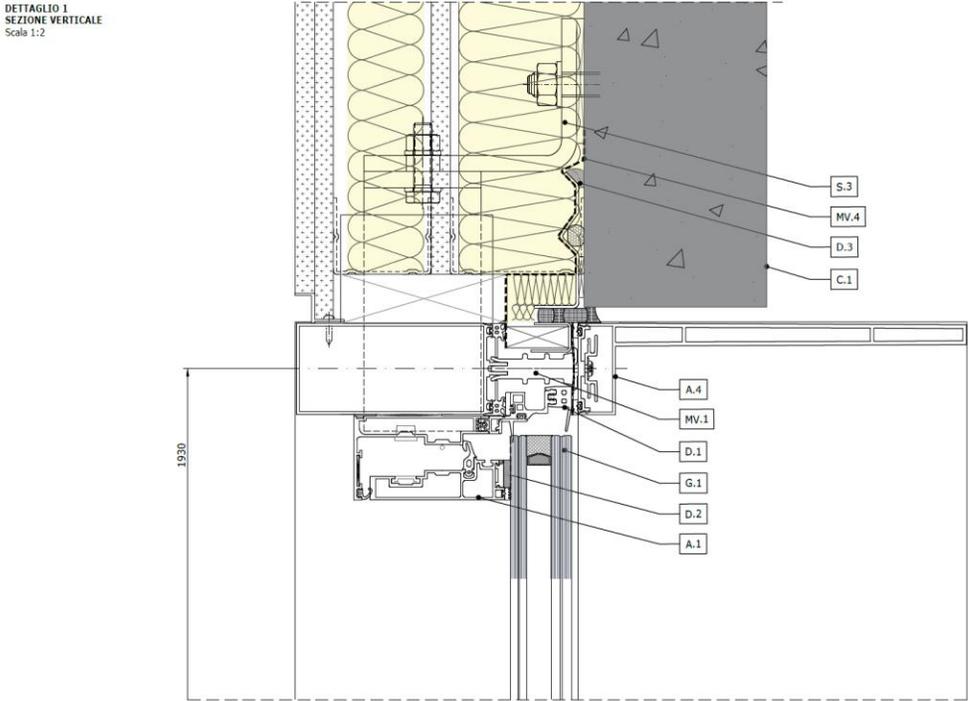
Standard Top Bracket Connection Detail developed with Revit: Author
